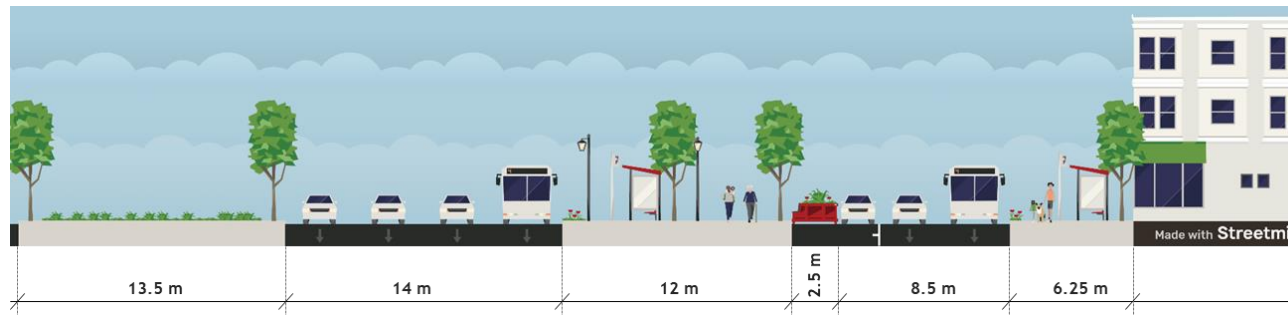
Proposed 100 M Cross - section for Ring Road
